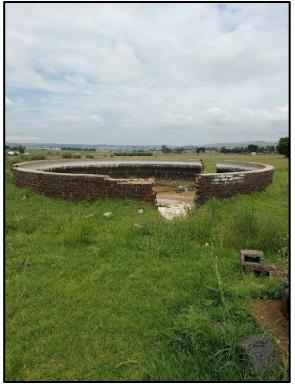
Existing degraded water reservoir situated near the foundations at EF004.
